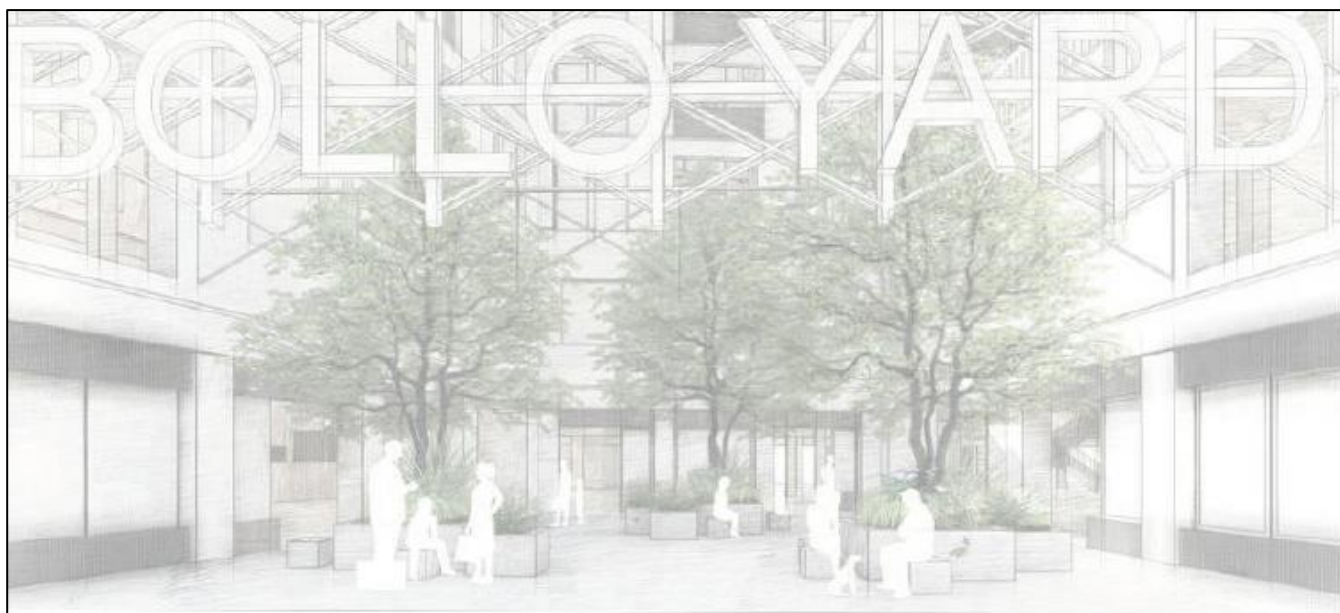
Commercial Indicative Landscaping for 67-81 Stirling Road
